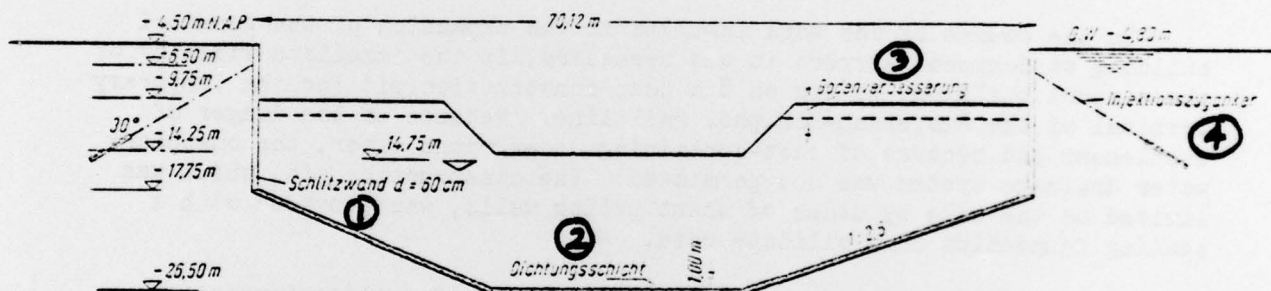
Cross Section, Construction Pit, Computer Center ABN, Amstelveen
